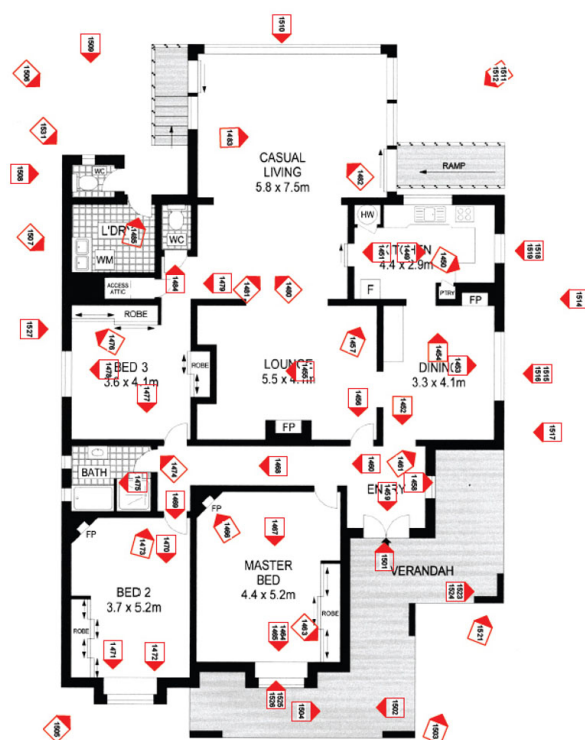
The layout of the house (not oriented to north), Source: Structural Engineer's report by Shreeji Consultants based on 7 July 2017 site inspection. Note peculiar layout with corner fireplaces and internalised lounge room.
